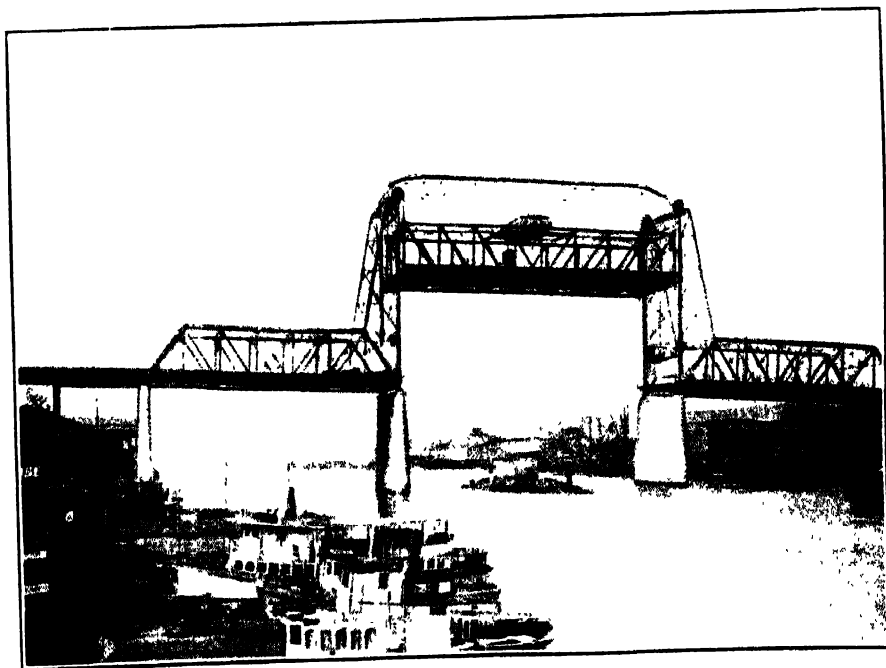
Bridge over the City Waterway at Tacoma, Wash.—Lifting Span Up.
